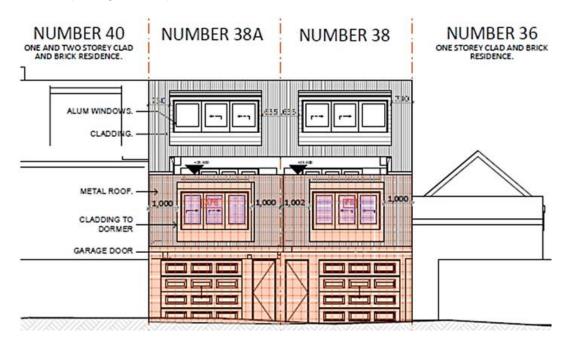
Salisbury Lane elevation of garage/studio buildings approved at 38 Princess Avenue.
